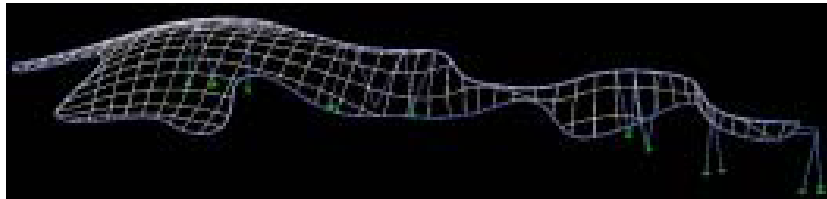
55. Structural schema, Brandscape BMW Pavilion, Geneva, Switzerland, Bernhard Franken and ABB Architekten (Source: Kolarevic, 2009)
